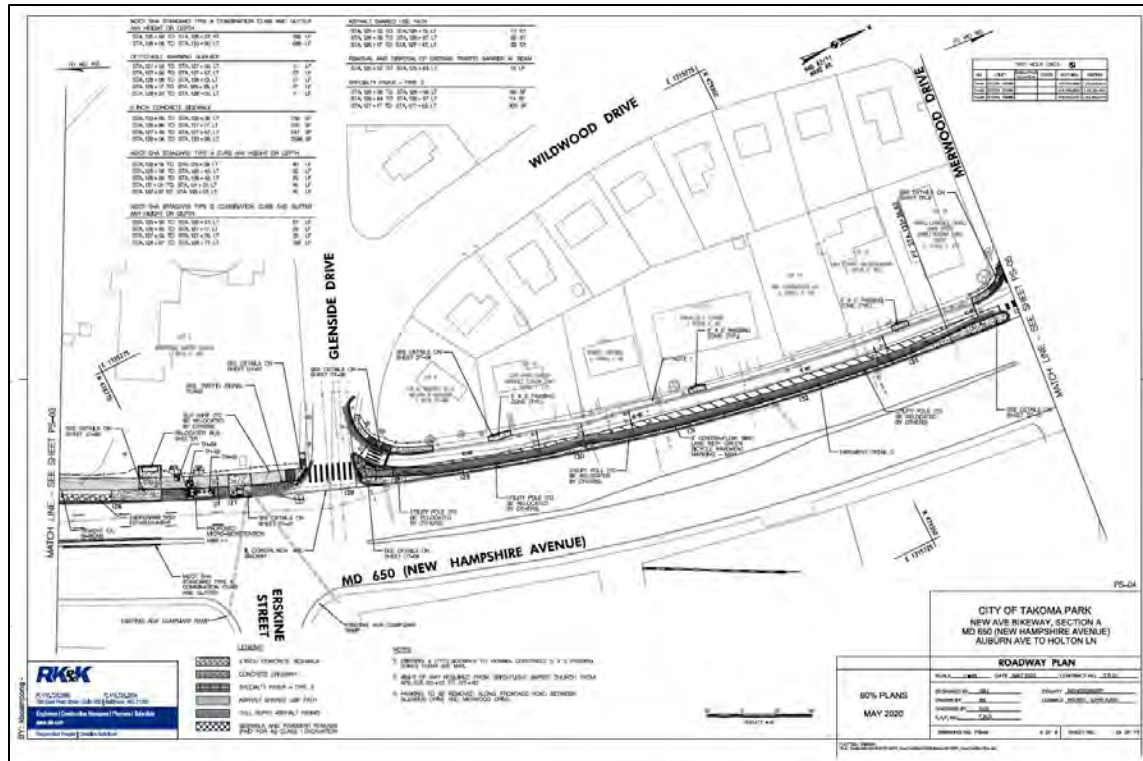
Plan View of Proposed New Avenue Section A Improvements (Part 4)
